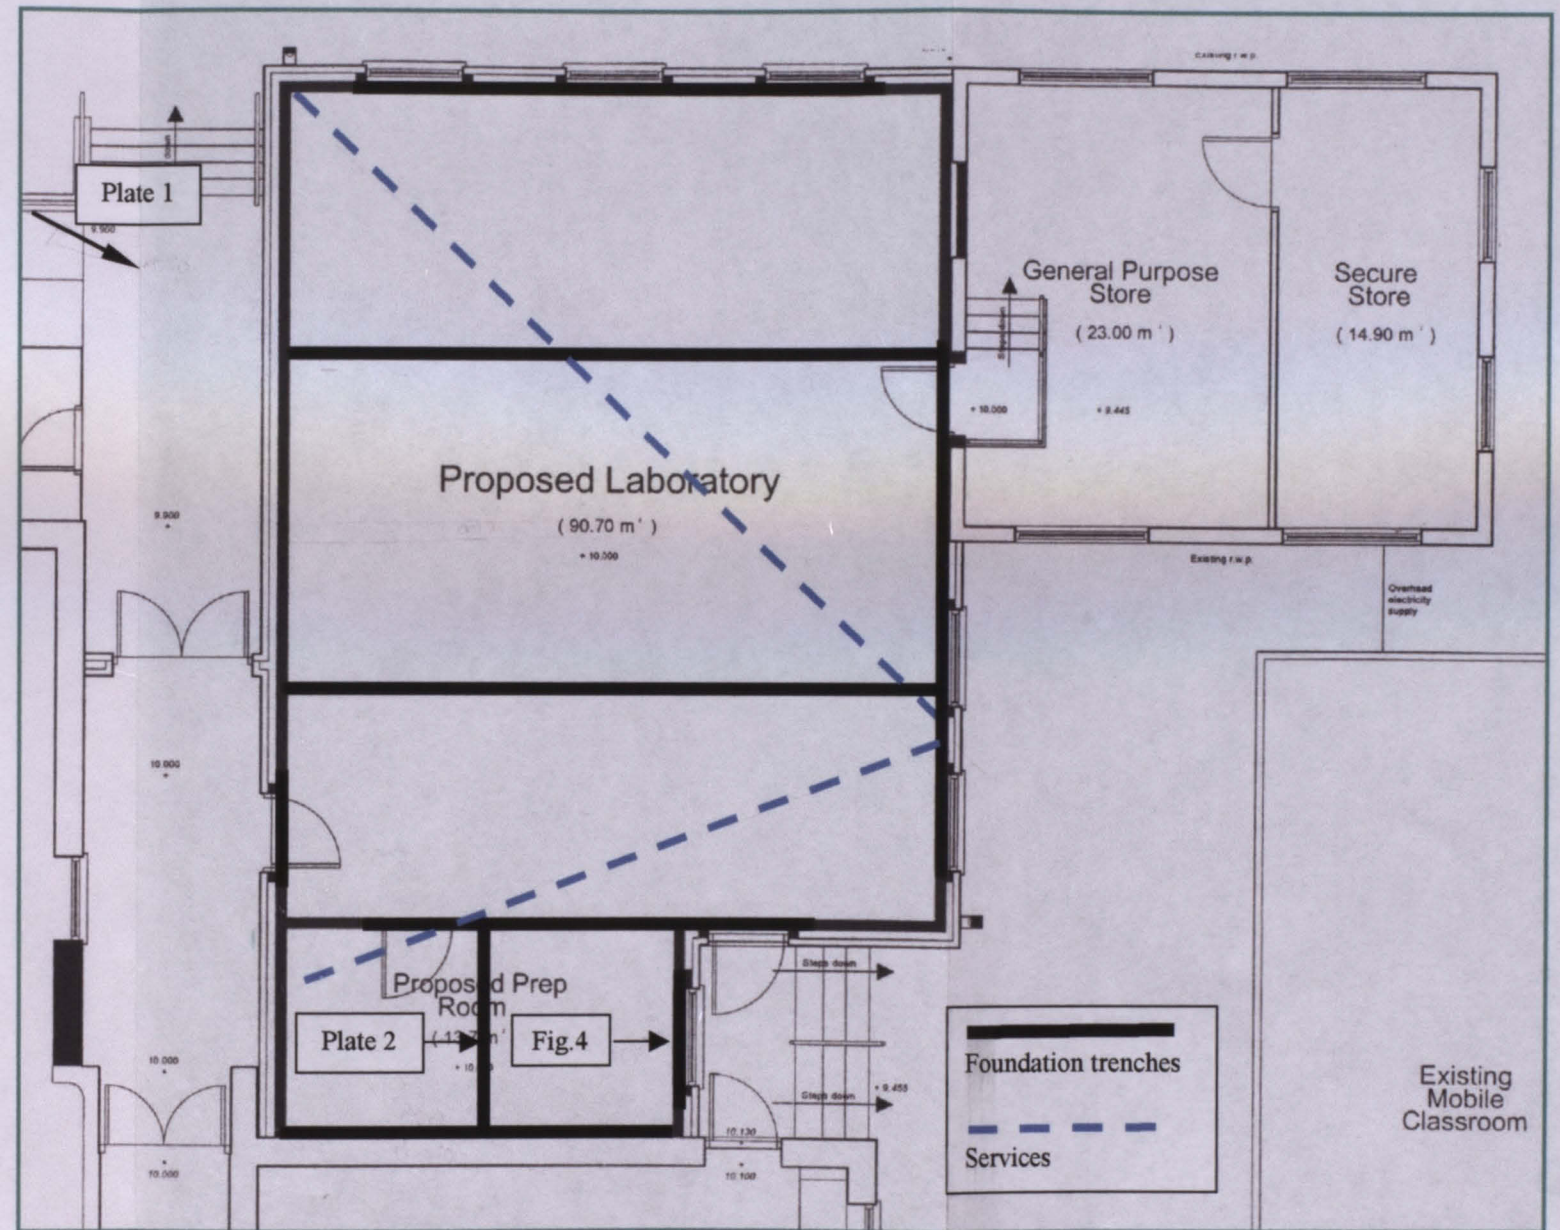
Development plan, showing the layout of the foundation trenches, services, and location of photographs and drawn sections (scale 1:100)
